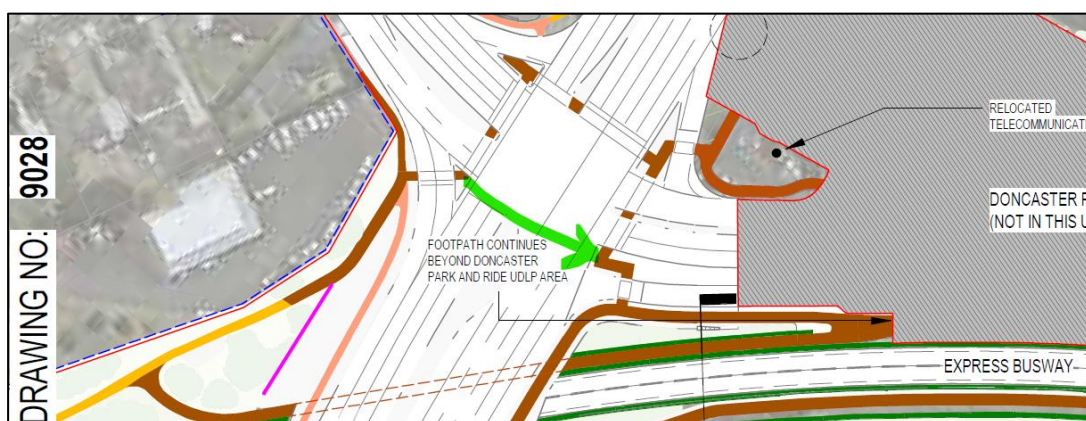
Excerpt of UDLP Attachment 1, Part 1, page 17 (drawing 9028) showing Council's recommended additional crossing point (green arrow) at Doncaster Road / High Street intersection.
